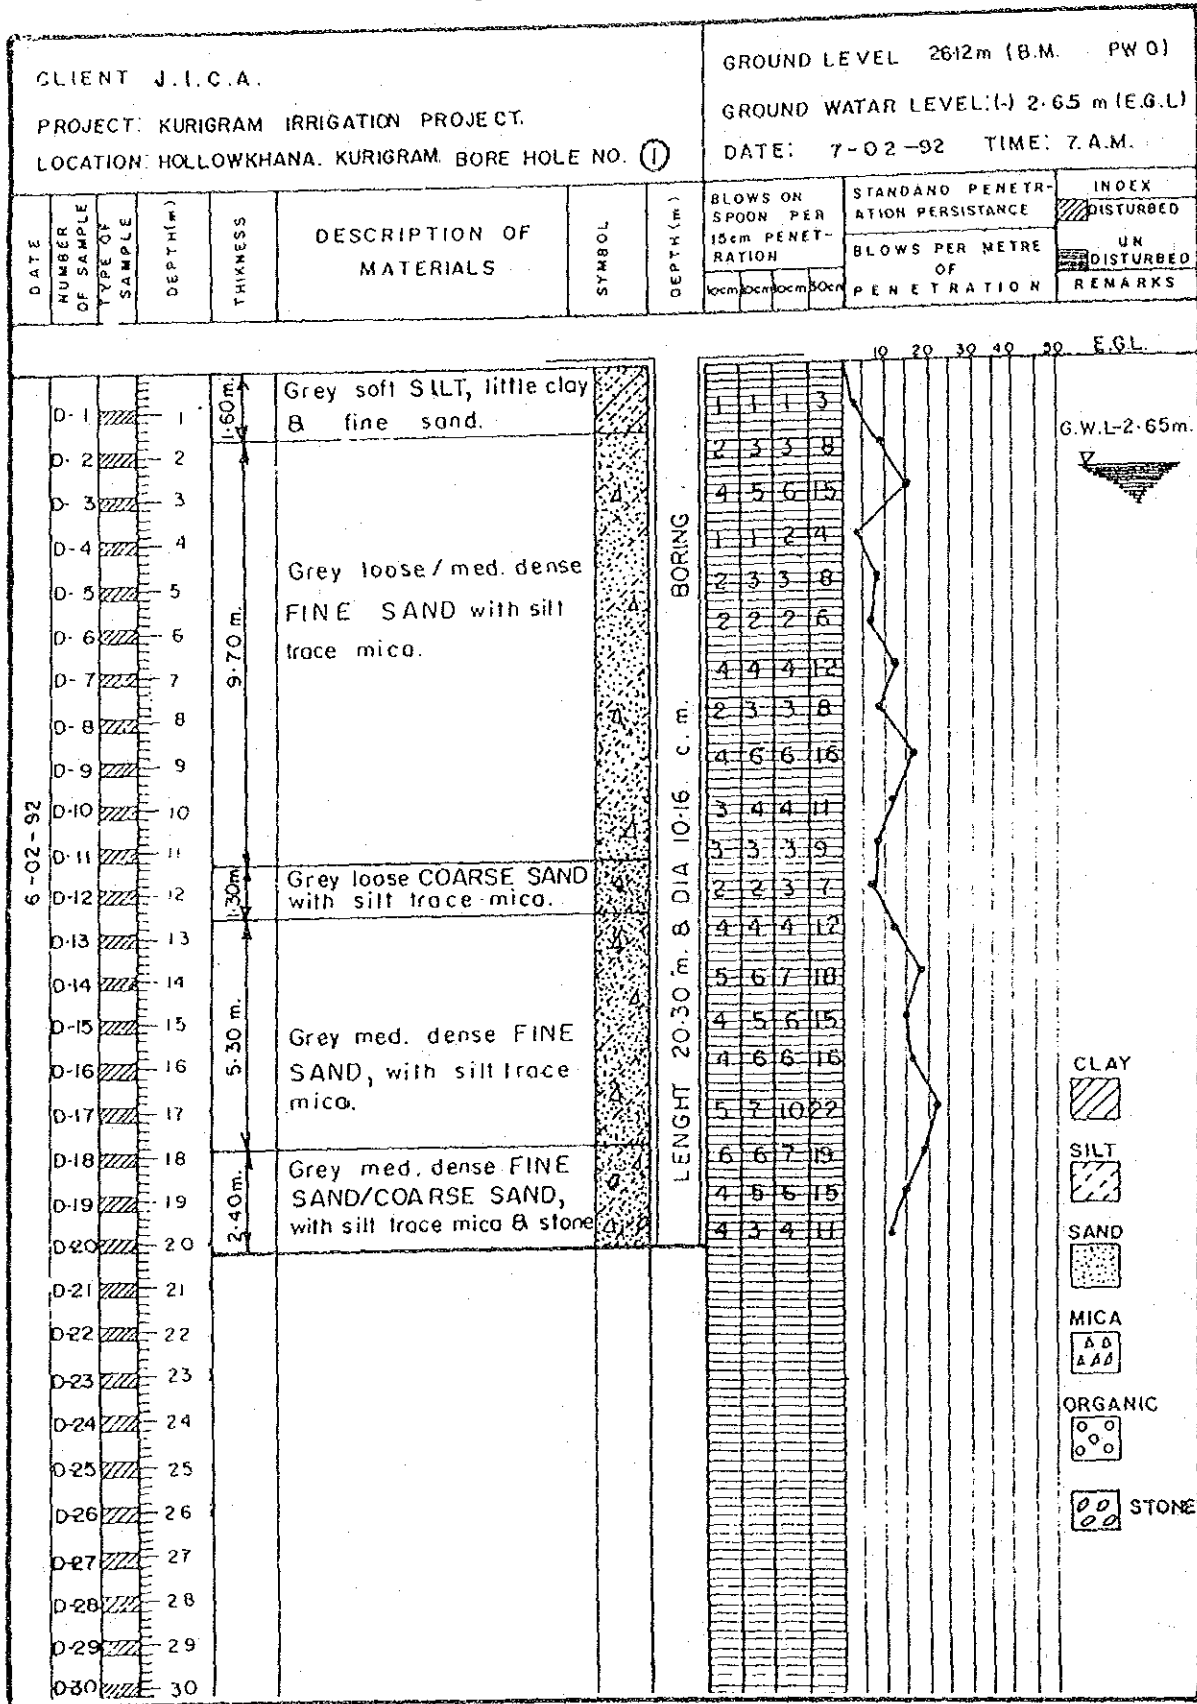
PROPOSED PUMPING STATION SITE (3/8)
